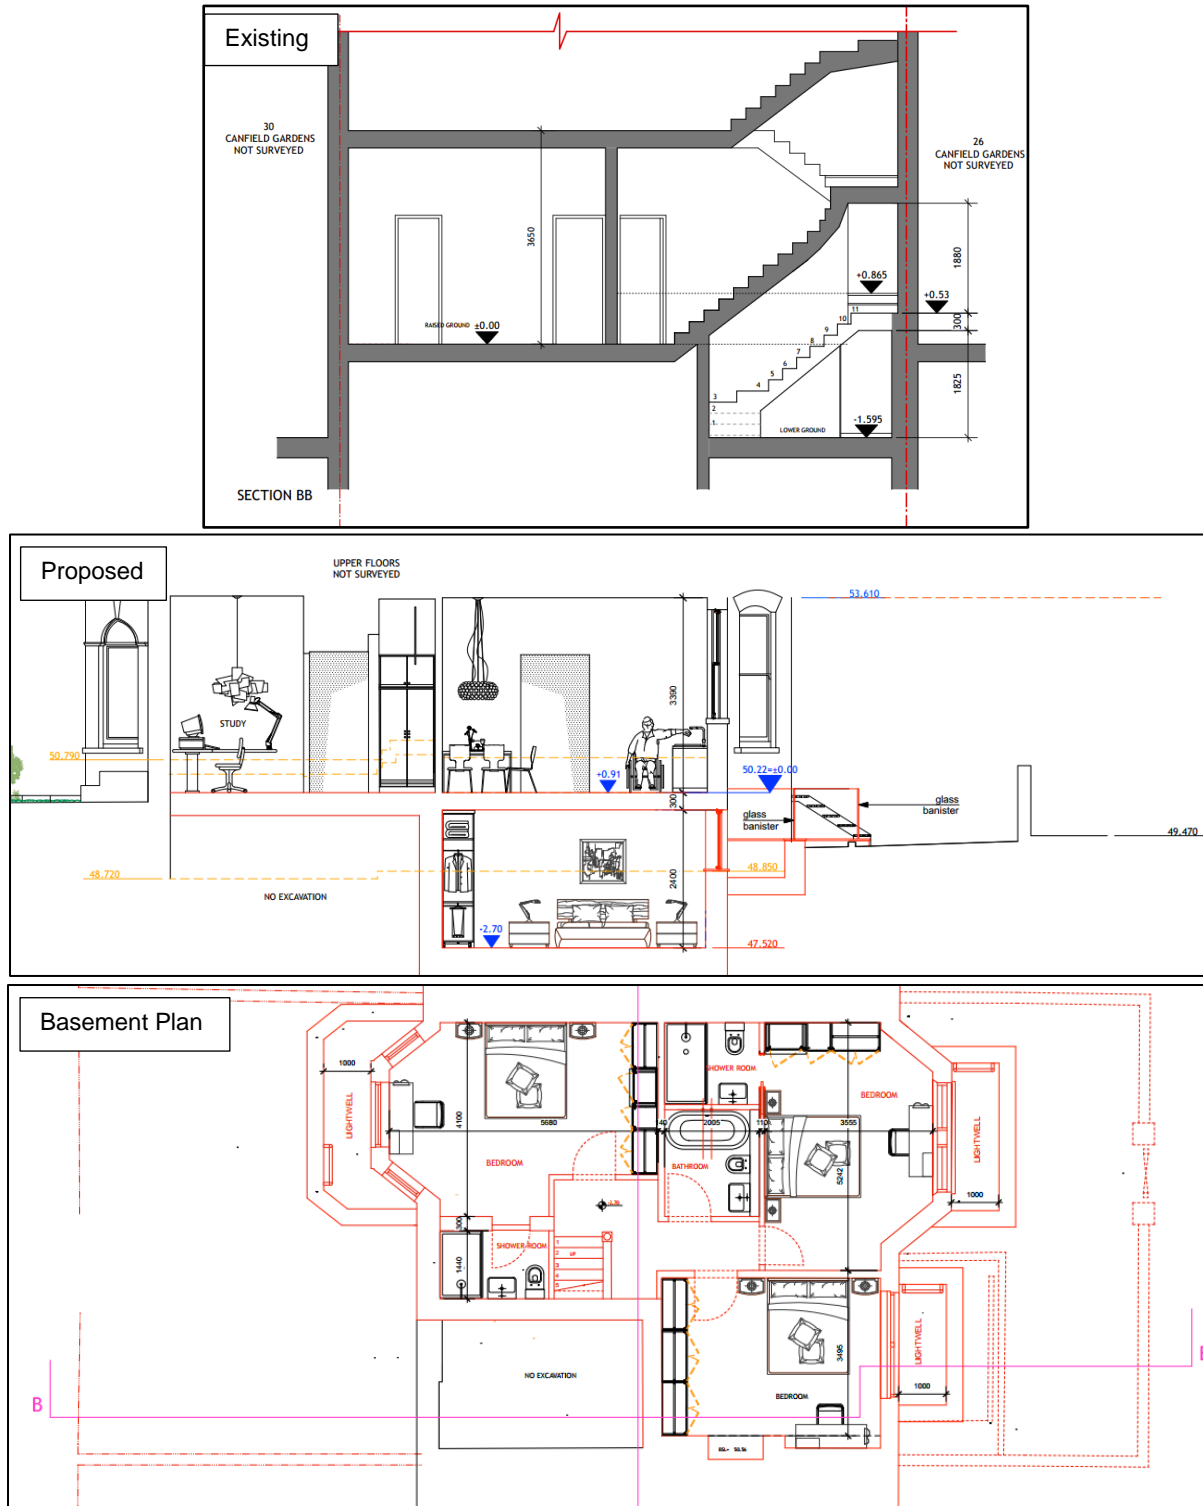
Sections of the existing and proposed elevations as well as the basement plan of the property.
